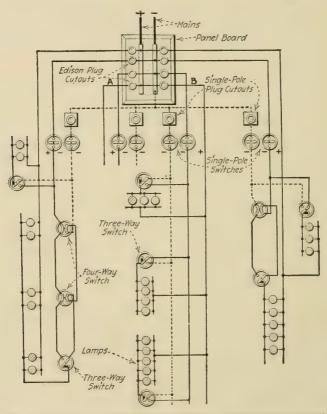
Universal-control master-switch wiring for an existing panel-box installation.
